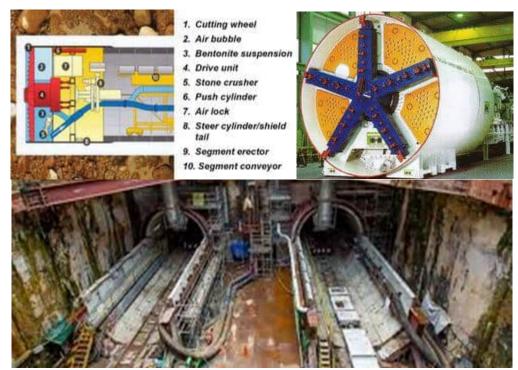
Examples of Slurry TBM [W-58] and Twin-Bored Tunnel at A Station Site in Singapore [W-21]
